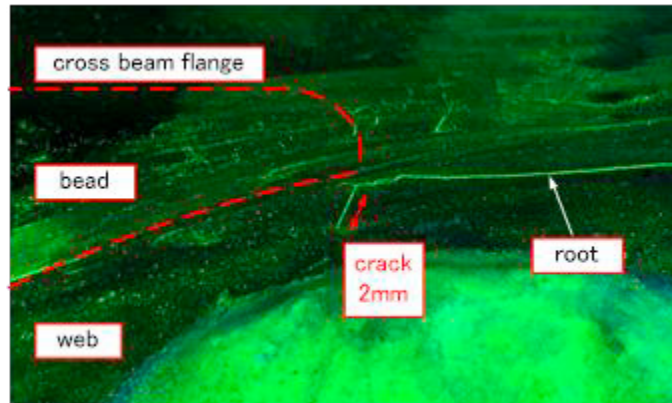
detected fatigue crack (N=1.9Mcycles, test part B')
